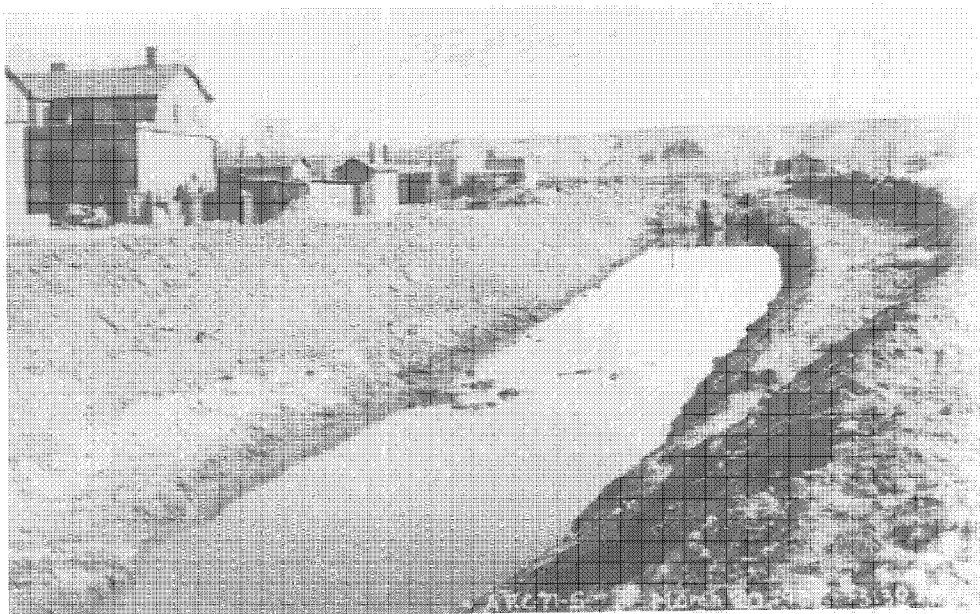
Initial Excavation of American Canal, 20 March 1937.
